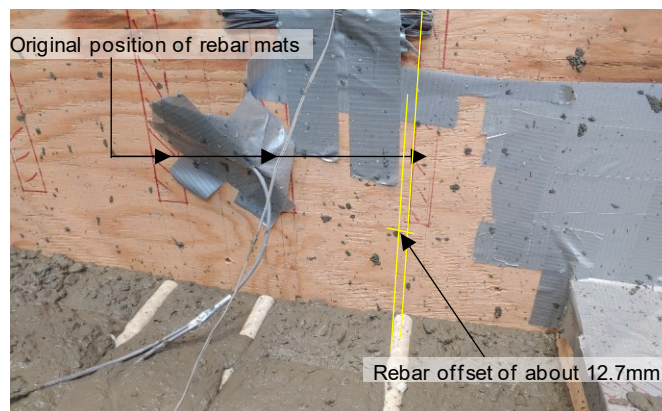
Shift of SP-03 reinforcement mats during deck concrete pour.
